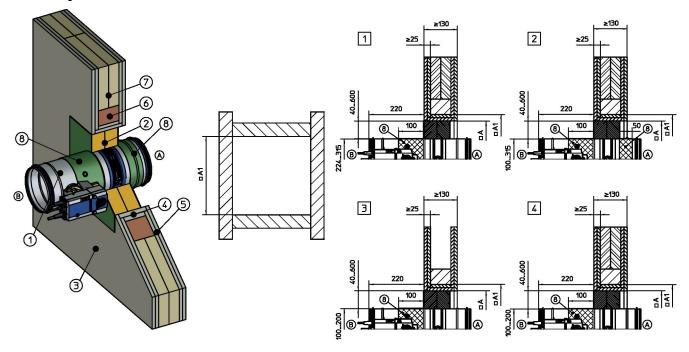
Dry mortarless installation into a lightweight partition wall with timber support structure, use of a fire batt
